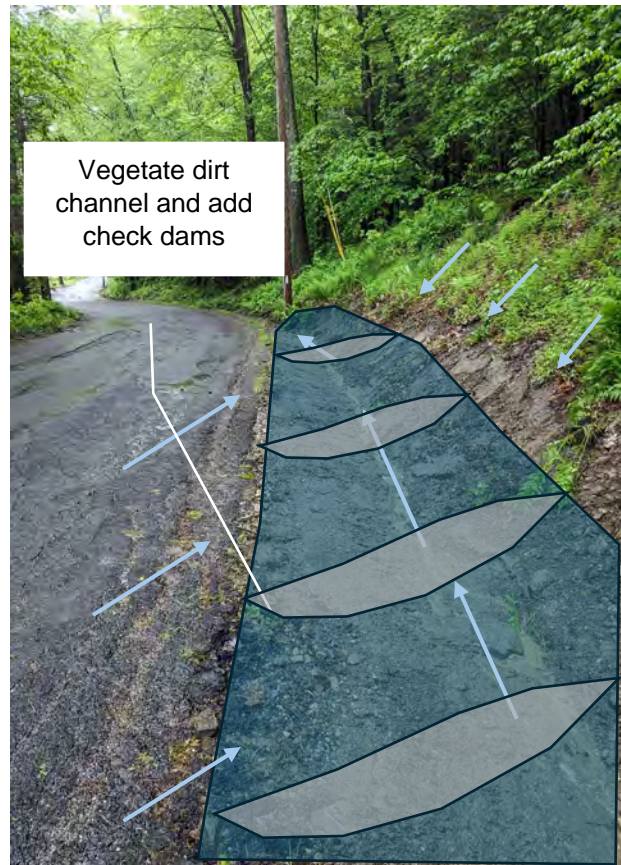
Sediment laden runoff and erosion along the existing ditch
